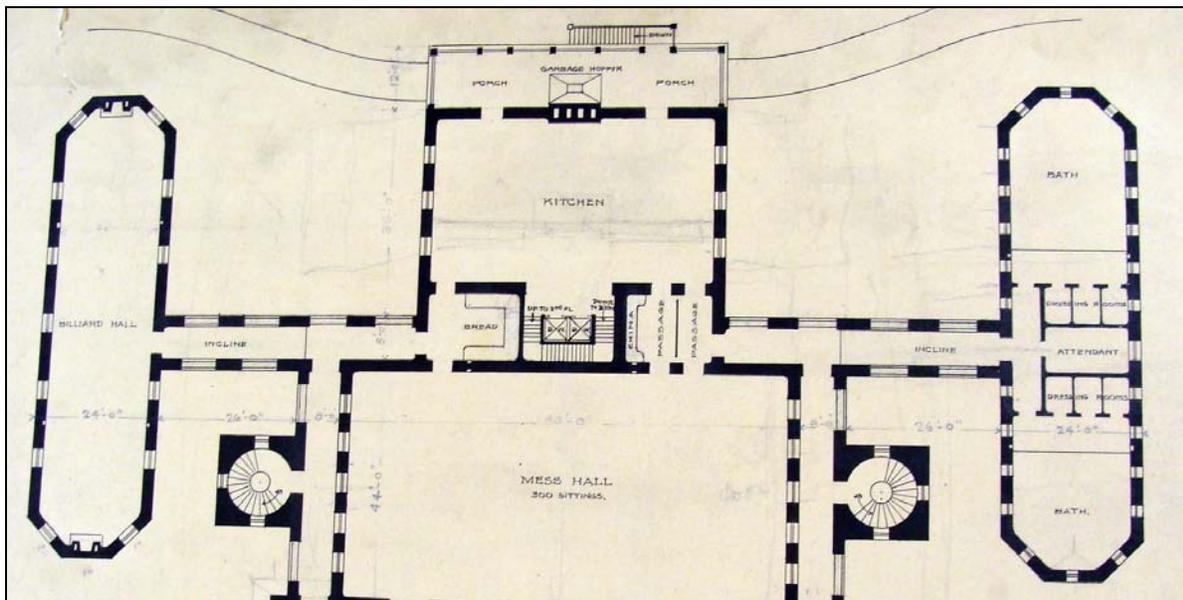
Excerpt of "Proposed Battle Mountain Sanitarium First Floor Plan," c. 1902
